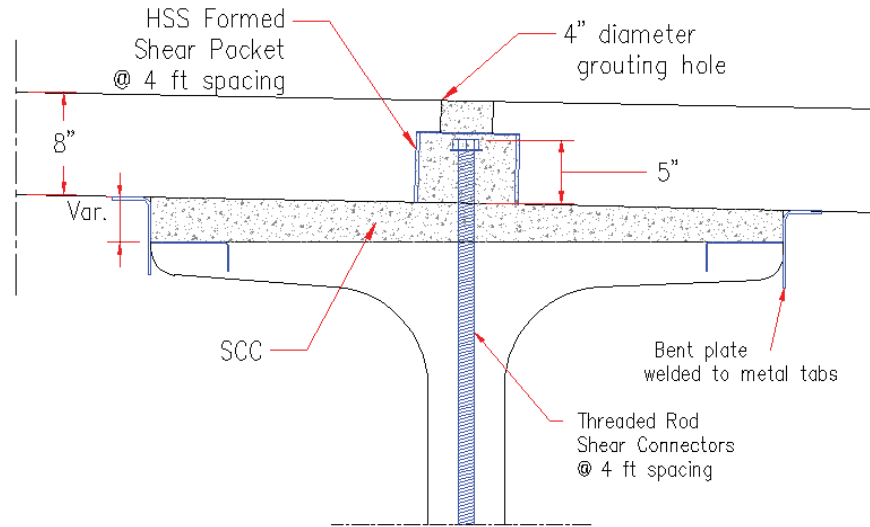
Precast Concrete Deck-to-Girder Connection using threaded rods and HSS-formed shear pockets in the deck panels.
